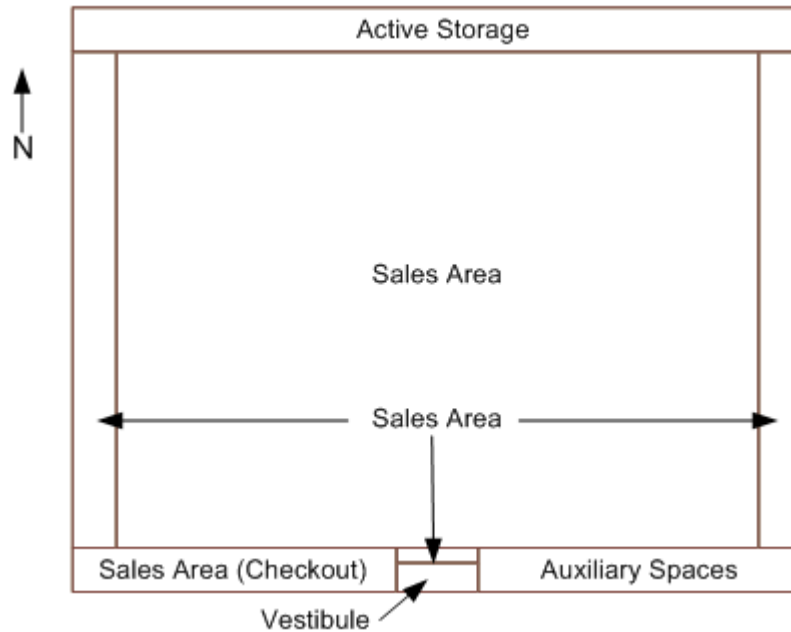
Medium Box Retail Store Prototype Model Floor Plan
